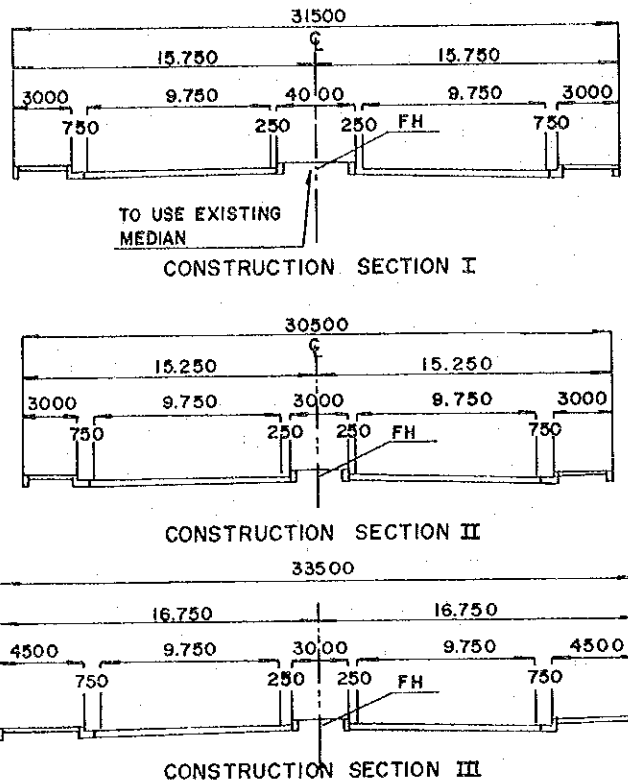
CONSTRUCTION SECTION OF CALLE 30
